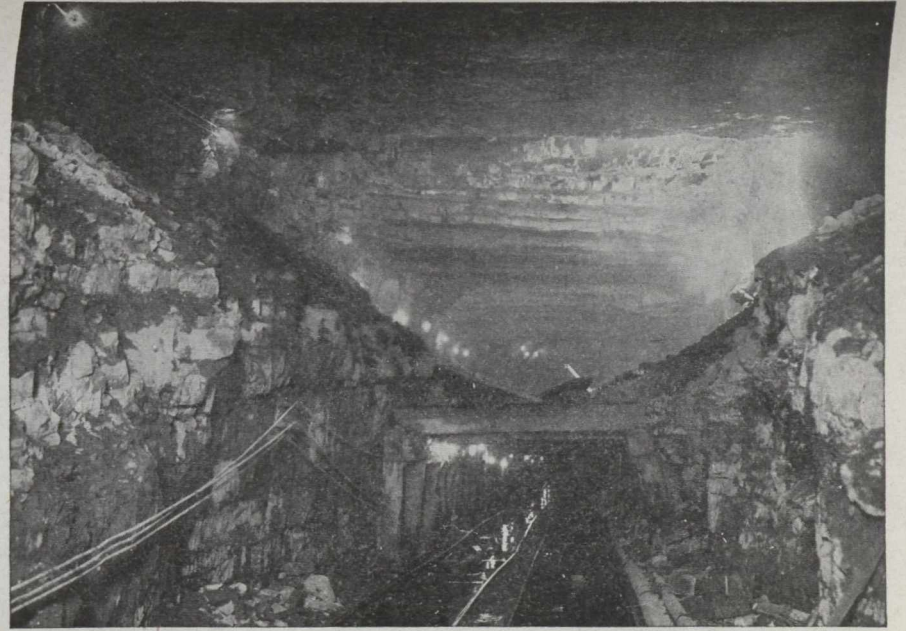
A "break-up," showing bottom heading, timbering and top excavation above
